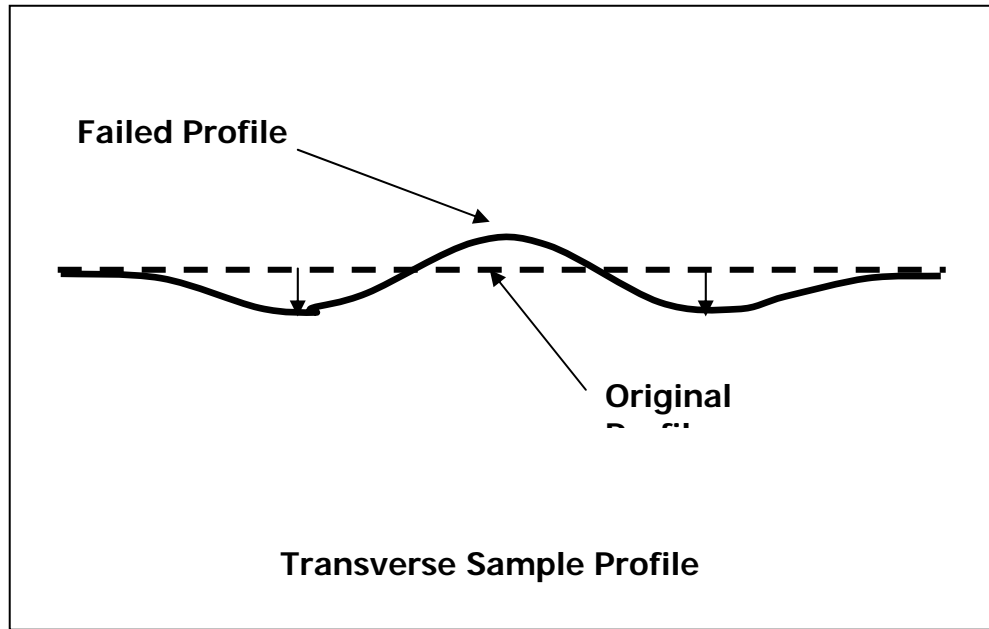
Transverse Profile of Rutting Due to Subgrade Failure
